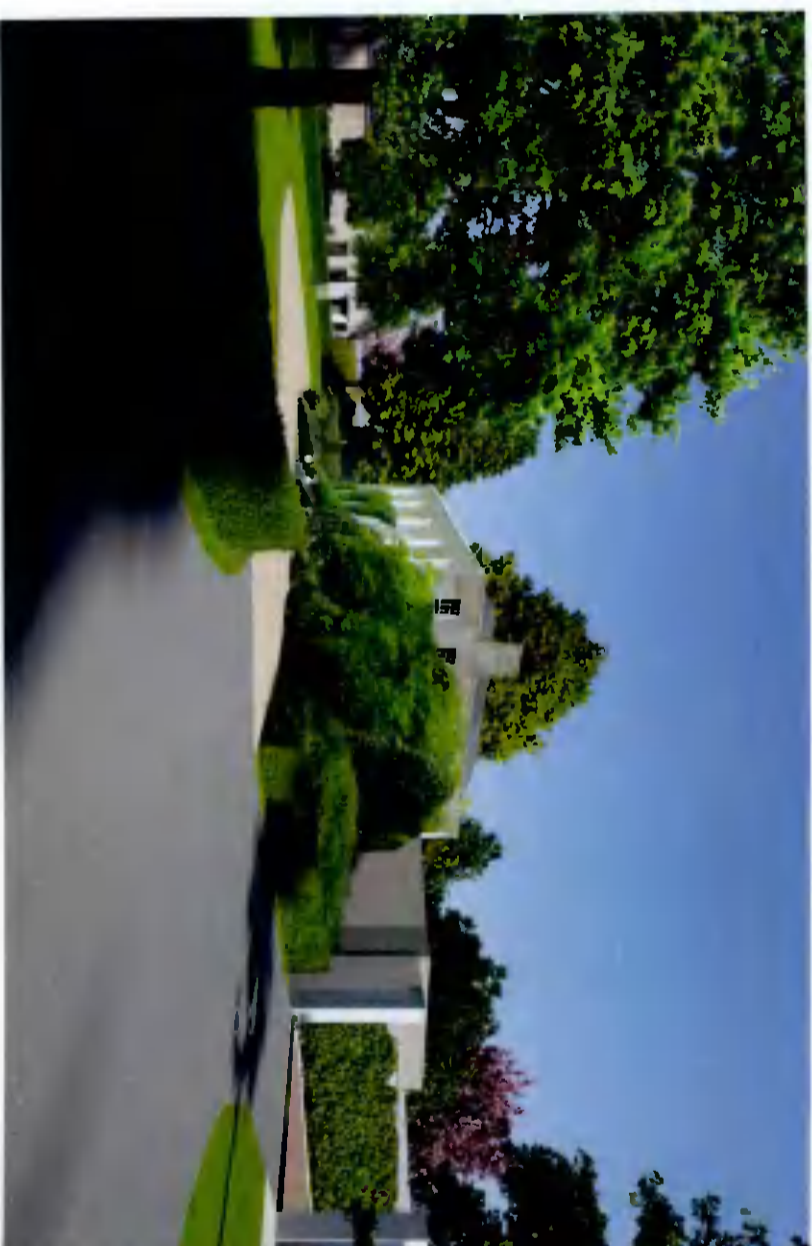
Rookwood House - Rookwood house retains its prominence, new entrance to Mews Development formed in flanking wall on west side, west courtyard providing sufficient spatial separation. Woodlands houses merge into the landscape.
